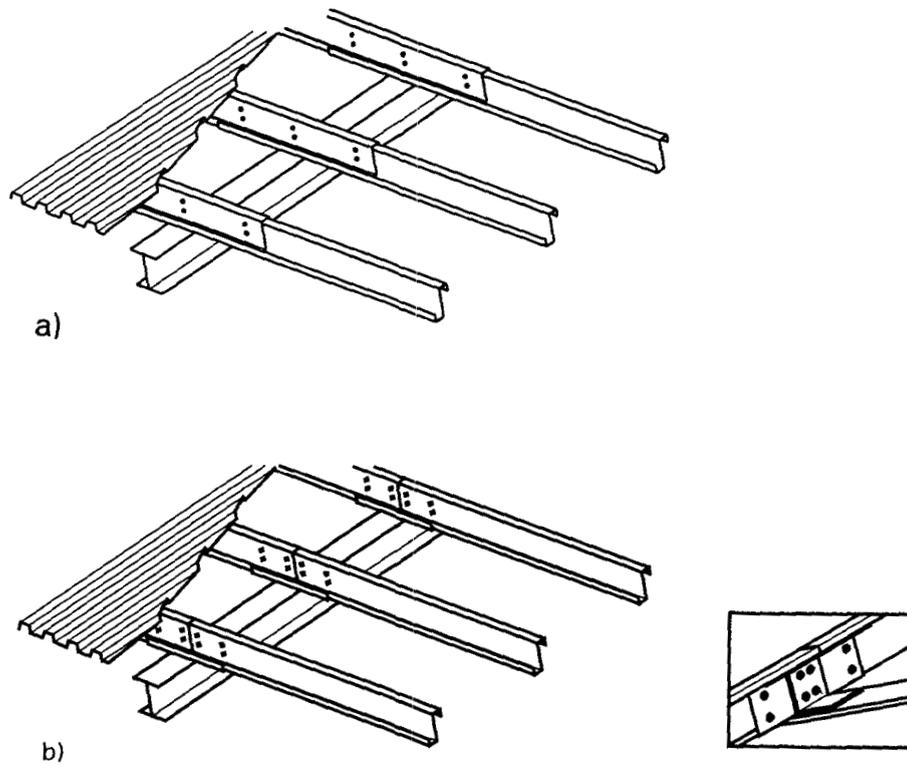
Purlin details at support, a) overlapped b) sleeved
